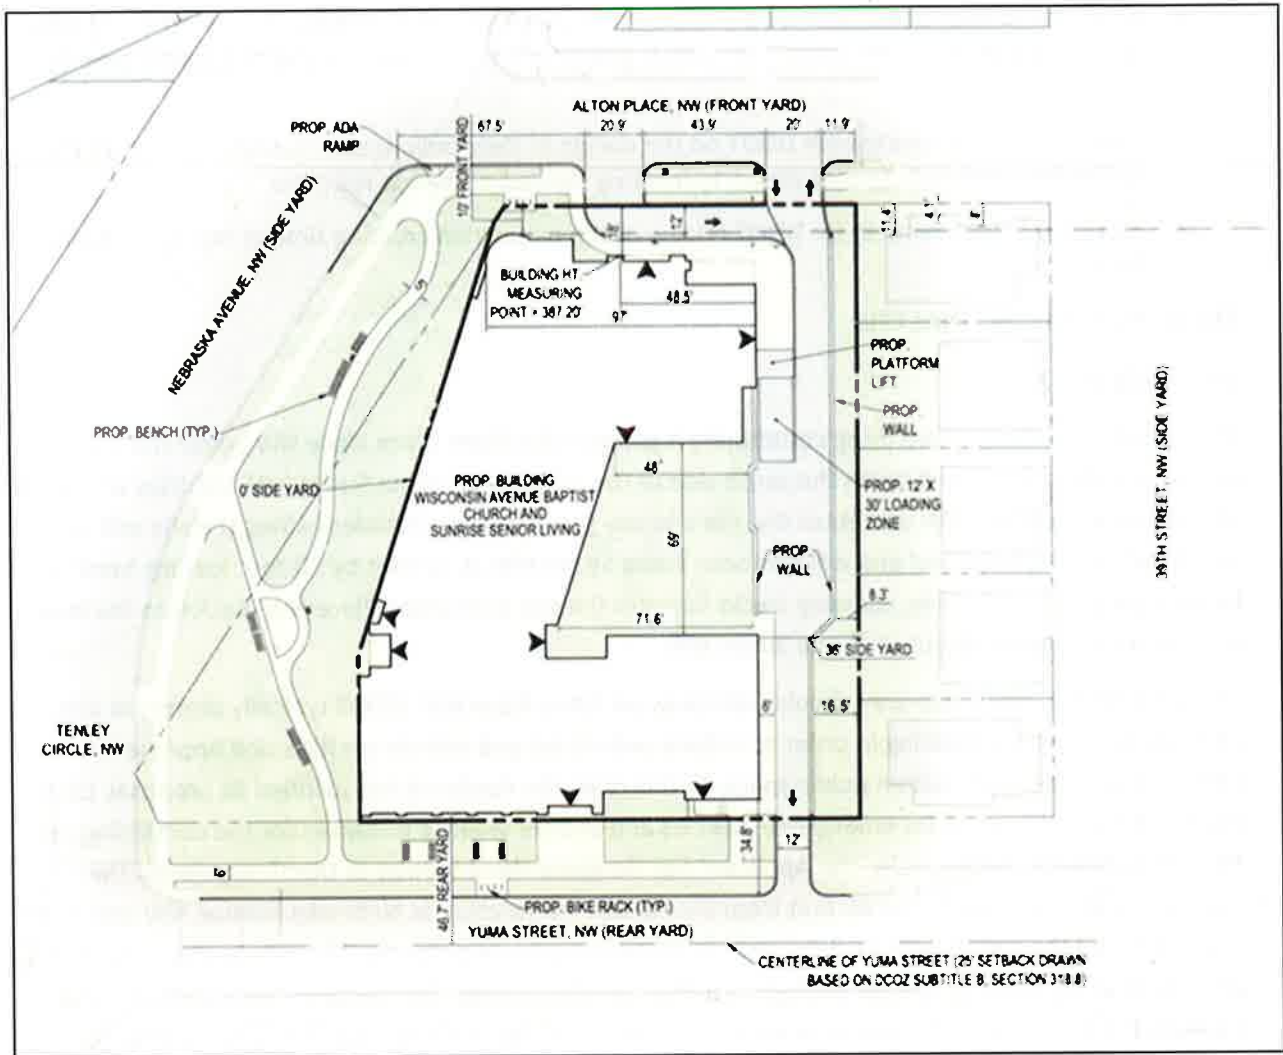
Site Plan (Source: Applicant’s Architectural Plans and Elevations, Exhibit 6A1, dated June 14, 2018)
